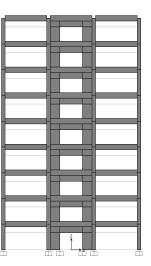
(a): Elevation of shear wall with opeings in high rise structure.
